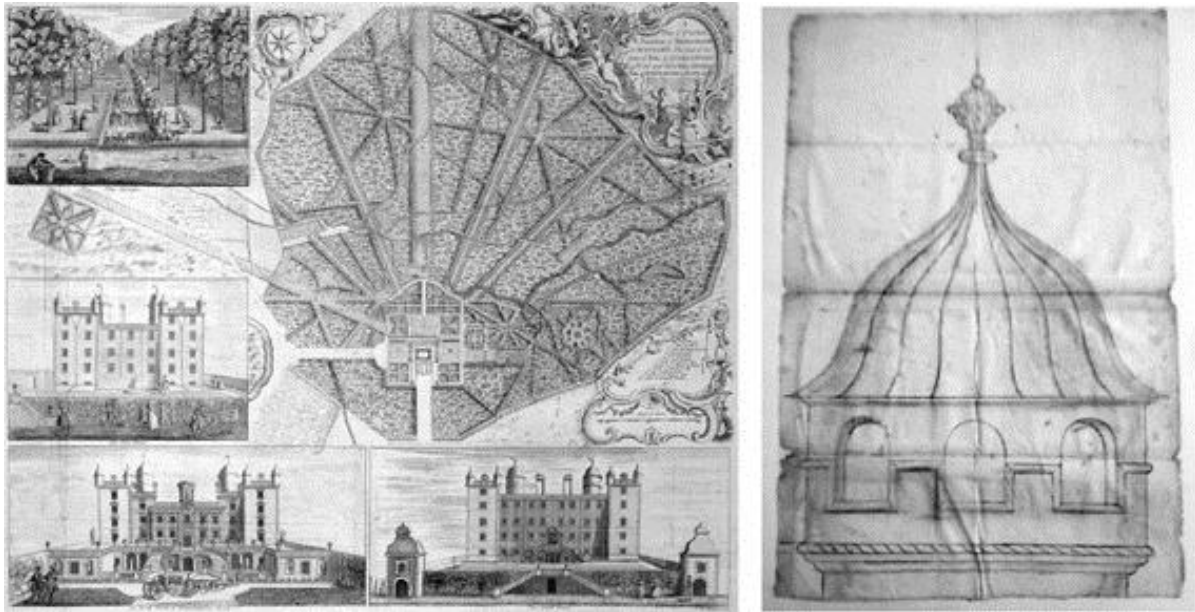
John Rocque plan and Roof of stair turret (Drumlanrig Archive)
